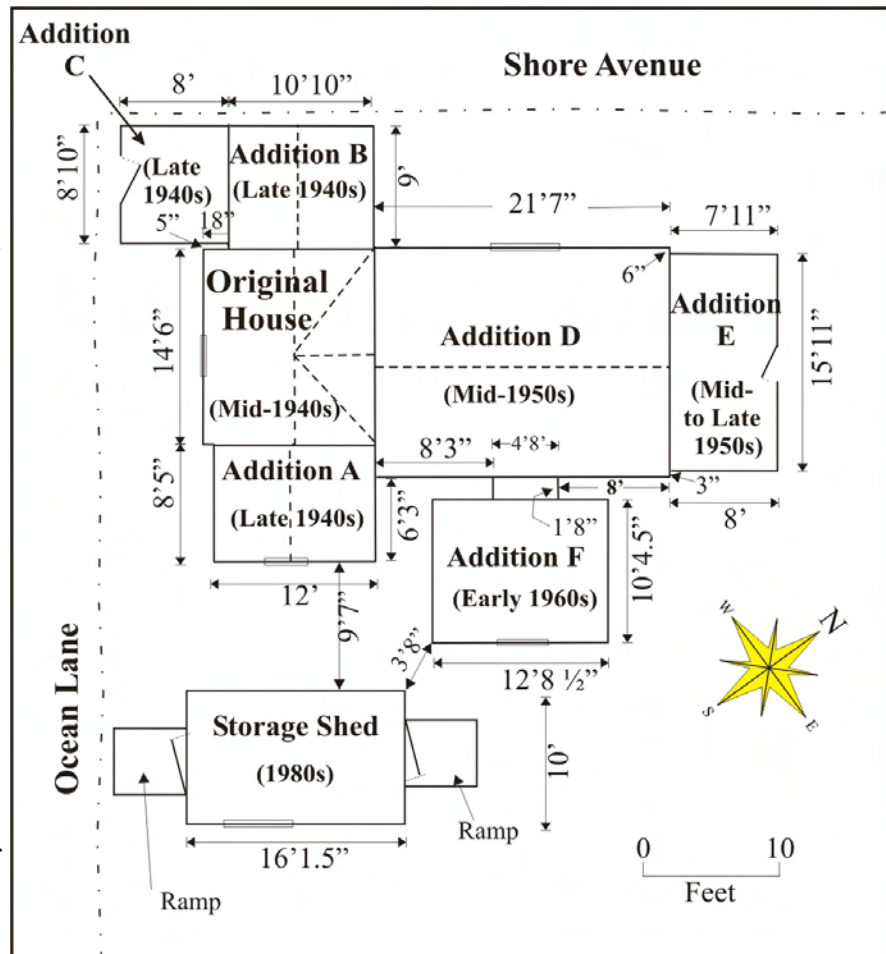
Plan of Jerry Coppock House at 711 Shore Avenue.
